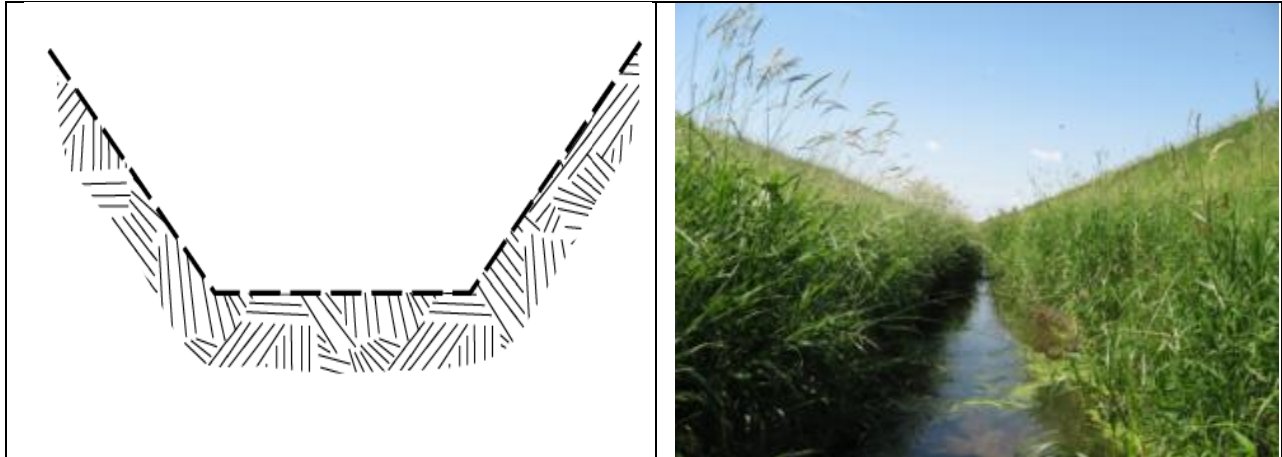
Cross-section of trapezoidal ditch design (left) and an example of this ditch design in NF Crow watershed (right).
